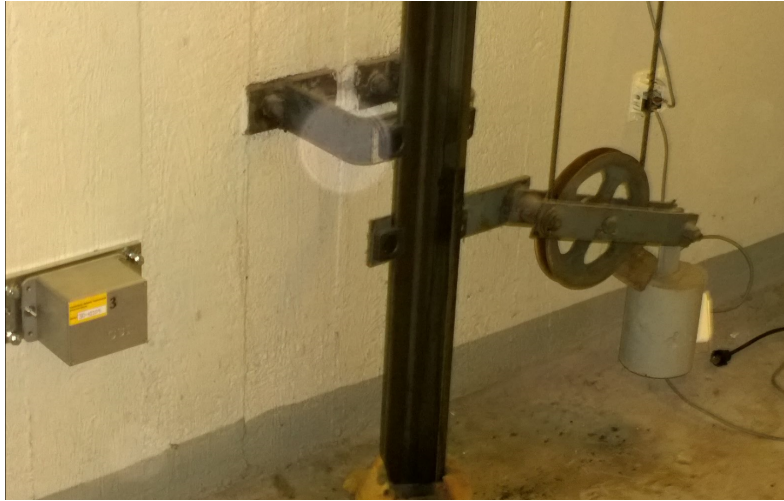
Sensor 3 located at the ground floor in the hoist way
